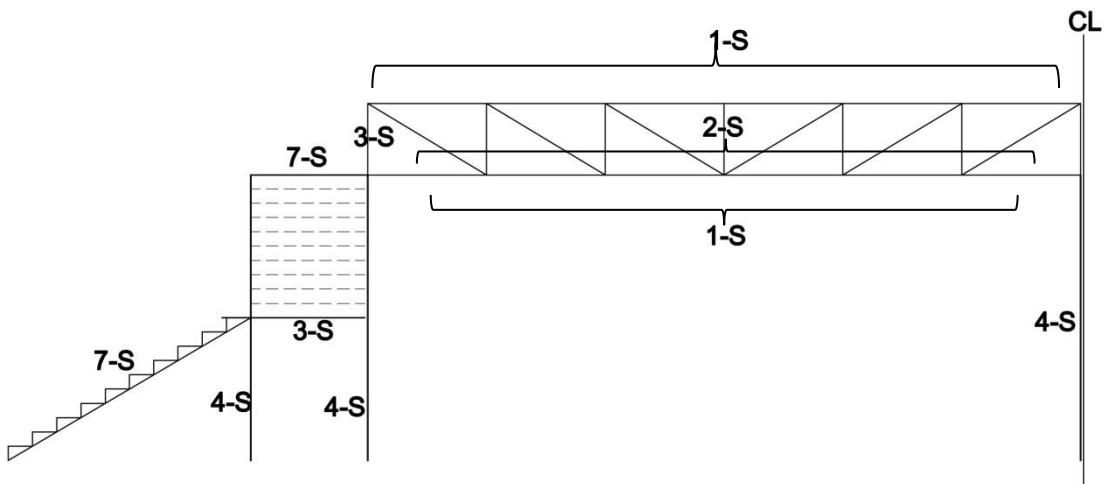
Section ID for elements of double span truss bridge (A6)
